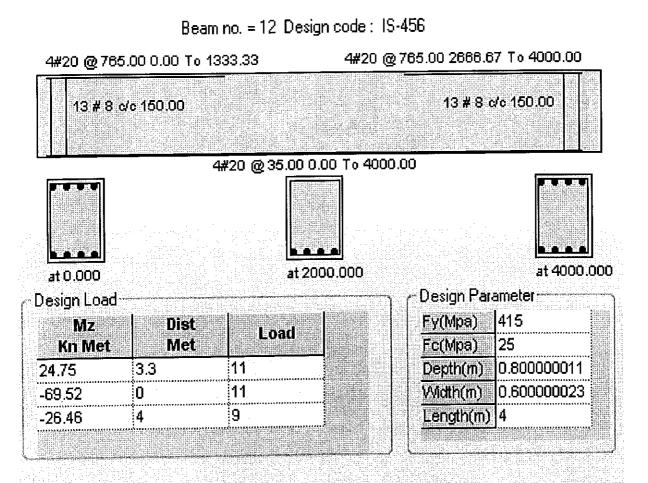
Detailing of the beams for the 4th, 5th and 6th storey in the above multi-storey building
